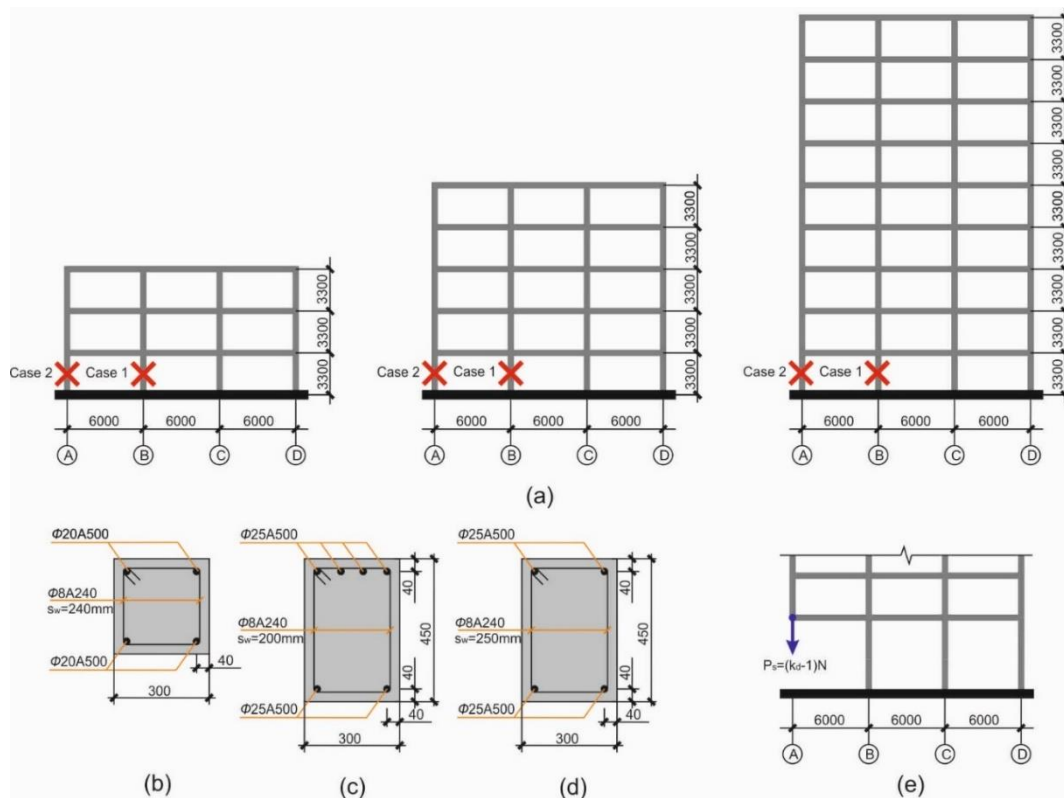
(a) Reinforced-concrete frames; (b) Cross-section and reinforcement scheme of columns; (c) Cross-section and reinforcement scheme of beams near columns; (d) Cross-section and reinforcement scheme of beams at mid-span; (e) Accidental impact
